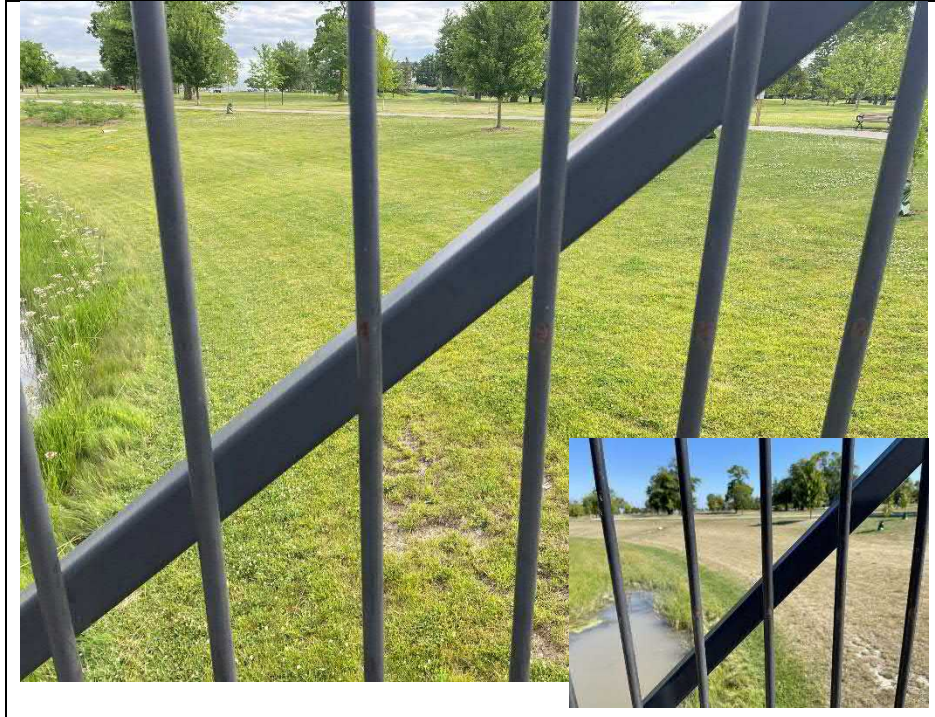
Top chord, railing system, truss verticals and diagonals (Looking Northeast)
